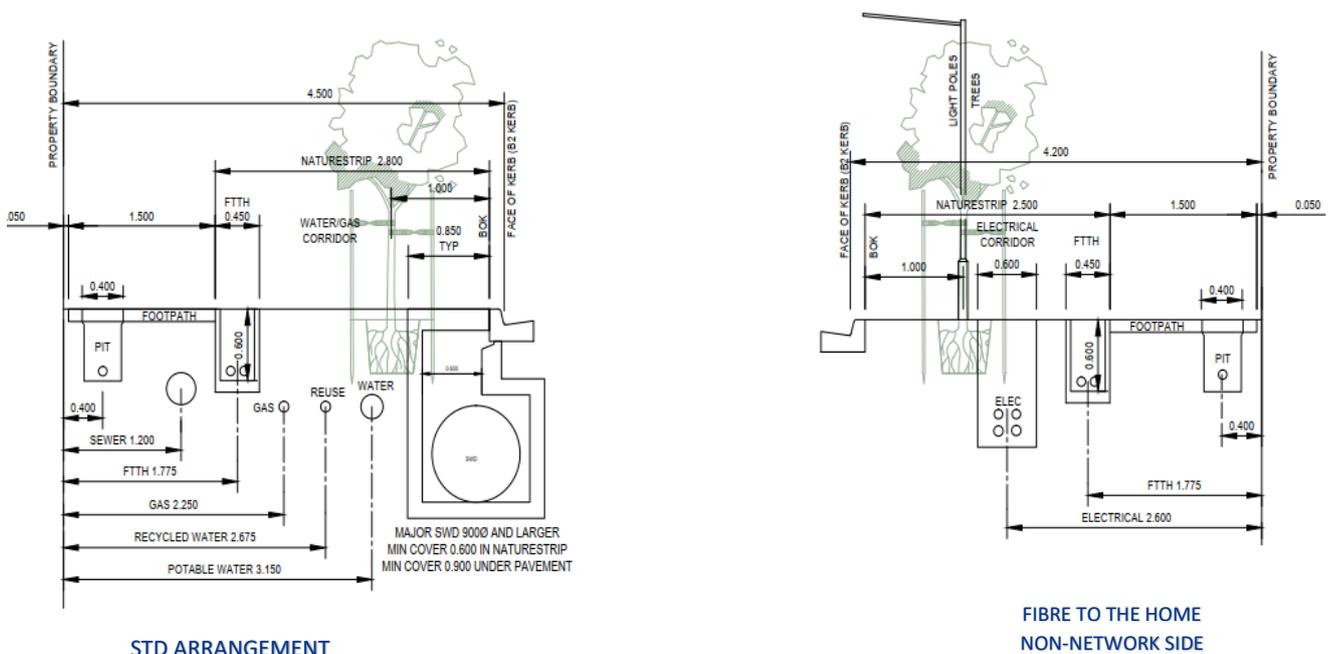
EDCM Service Locations – Cross Sections for Trunk Services Appendix D – Figure 004 (Sections Not To Scale)
